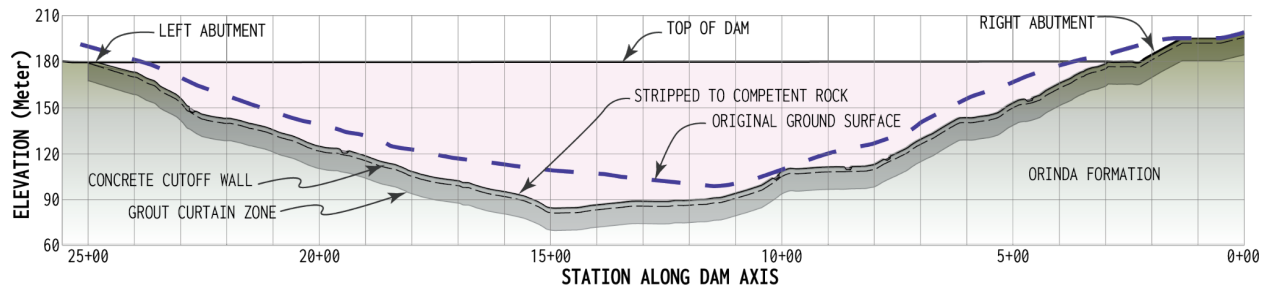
Longitudinal profile of Briones Dam along the dam axis (1:1 scale, looking downstream)
